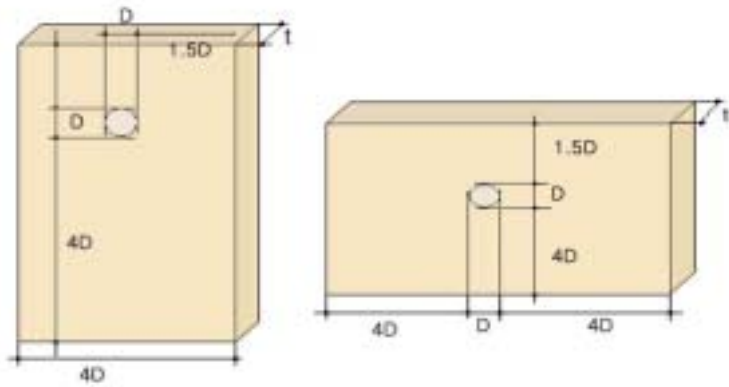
Minimum size of connected member and location of bolt hole ( $D$  : bolt diameter,  $t$  : thickness).
